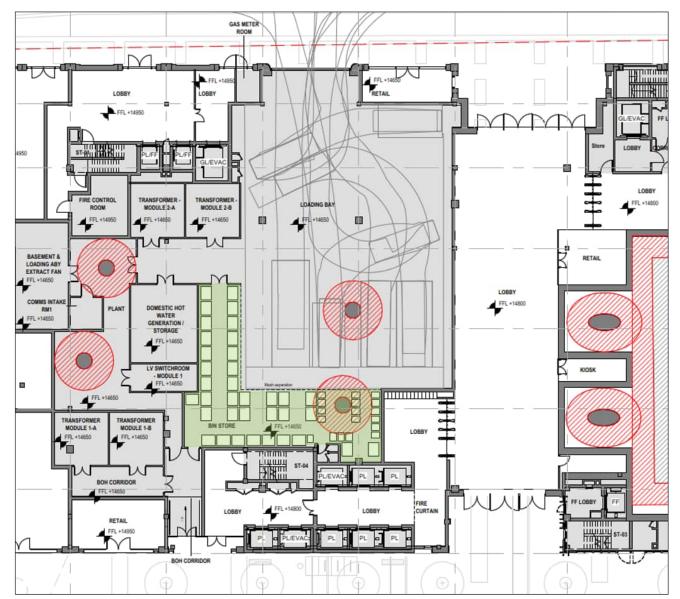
Waste Store Room at Ground Floor Level south of the Service Yard
